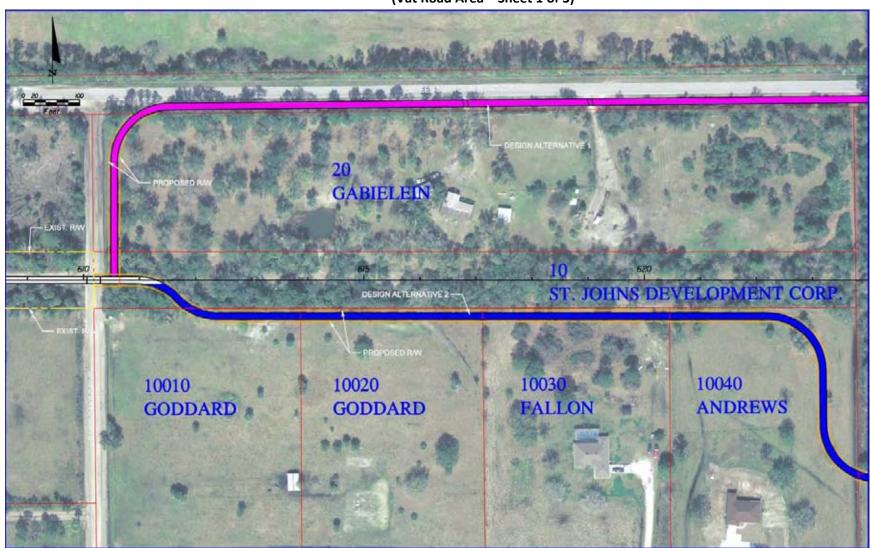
Alternative Alignment Section Sta 610 to Sta 624 (Vat Road Area – Sheet 1 of 3)
